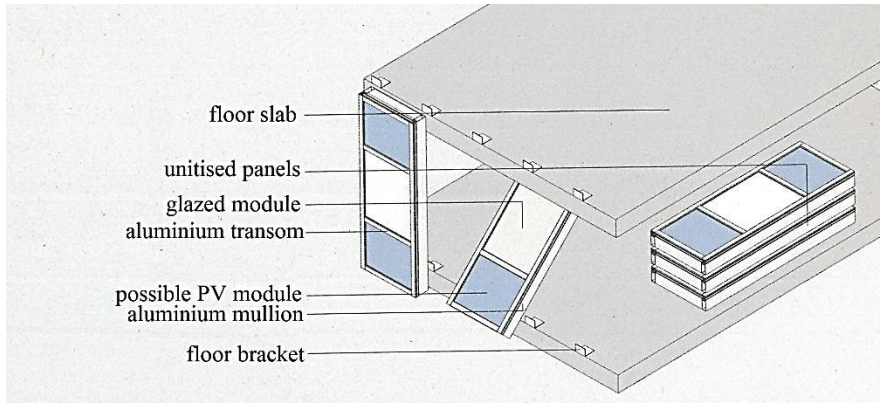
Unitized curtain-wall storage and the erection from inside (Roberts and Guariento, 2009).
